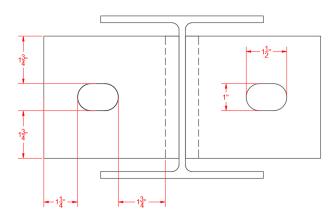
Plan View of Double-Angle Bracket without Top Rail
